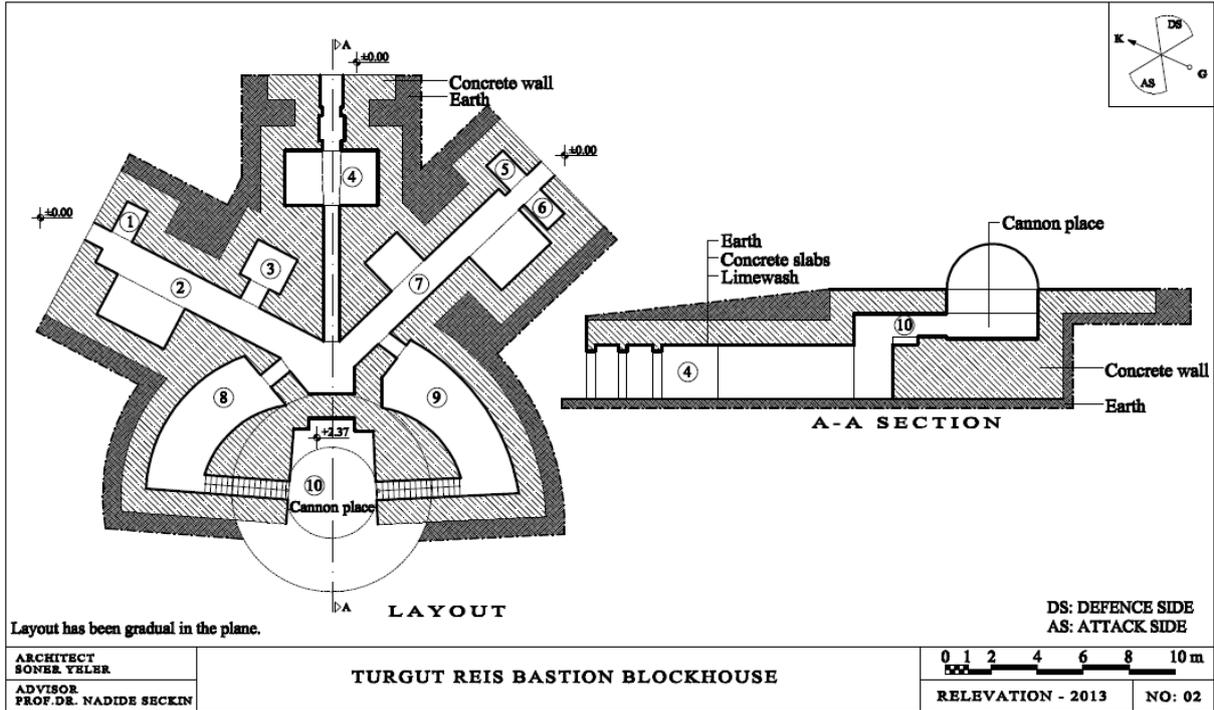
The example of concrete construction system, Blockhouse of Turgut Reis Bastion, 2013 [8]
